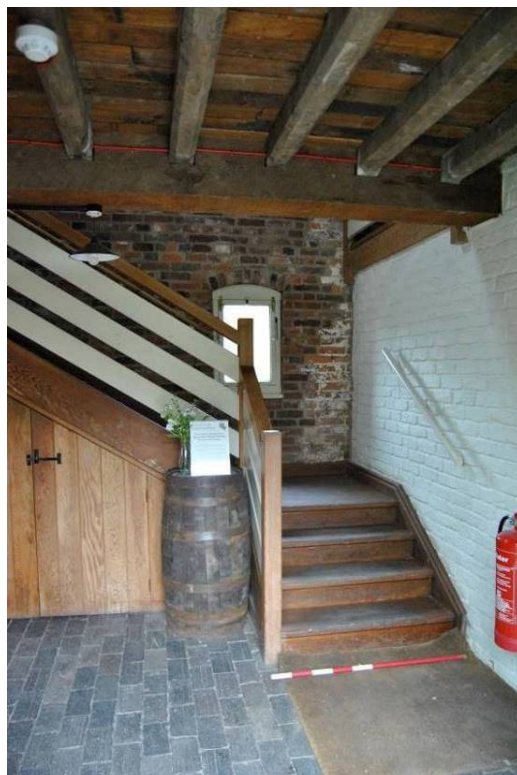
Stair rising to north side of Bay 1/2 ([G1]).
